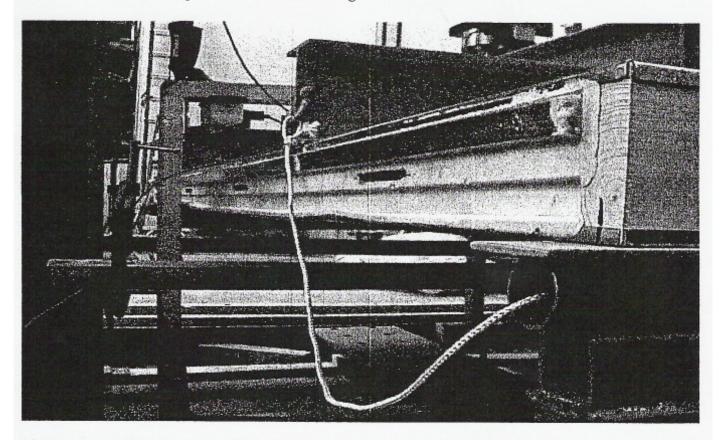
Response of 8' Galv.-Galv. Panel Under Transverse Loading
